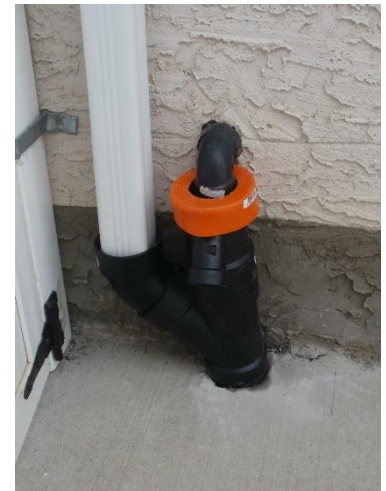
Direct connection of Roof drain and sump pump to sewer
